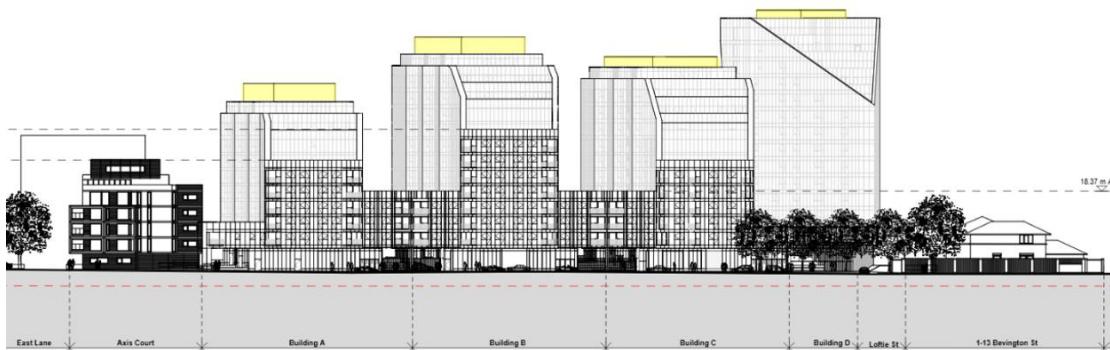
Plant enclosures as shown on proposed plan 031 P6
